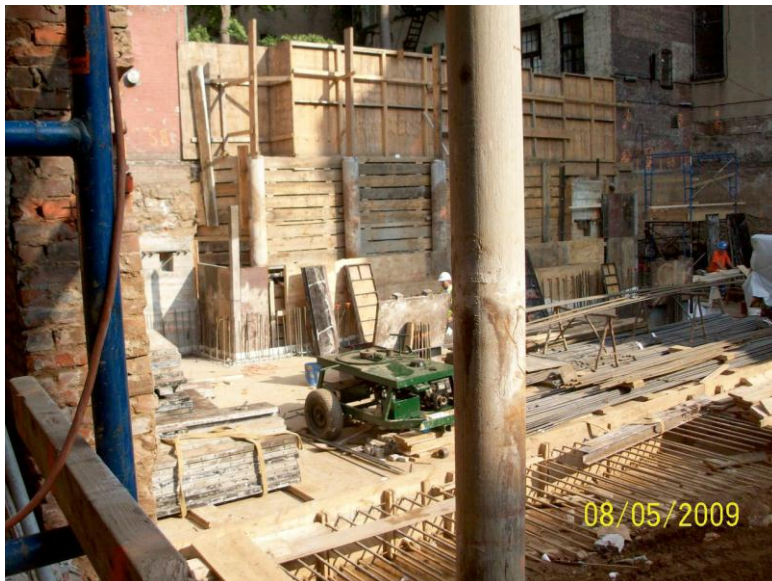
Show the Sheeting (Lagging) and Piles on the West Side (Mac Dougal Street)
